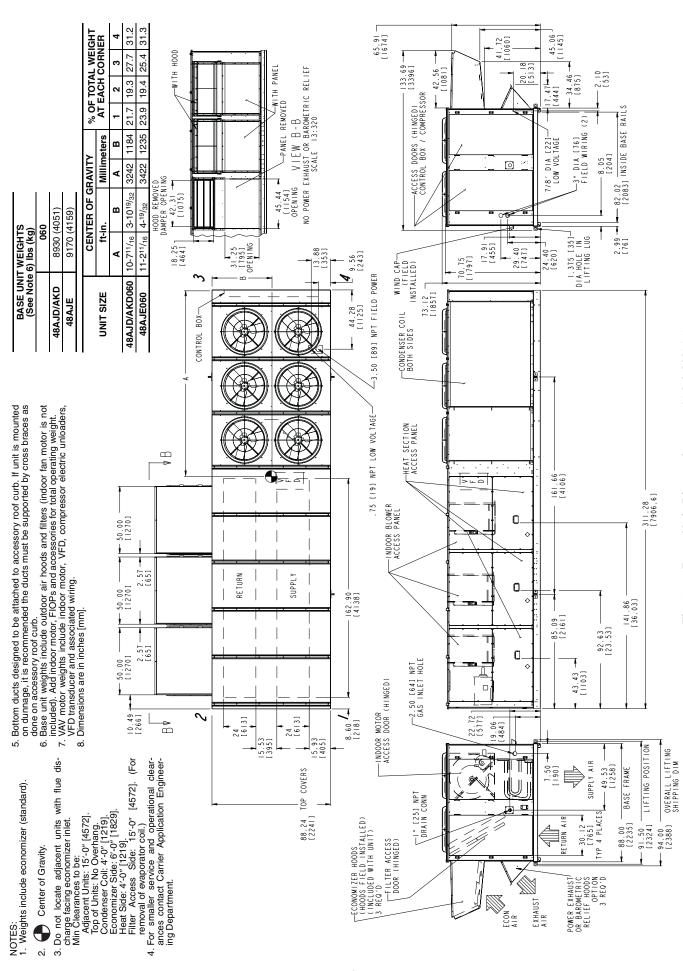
Base Unit Dimensions — 48AJ, AK060
